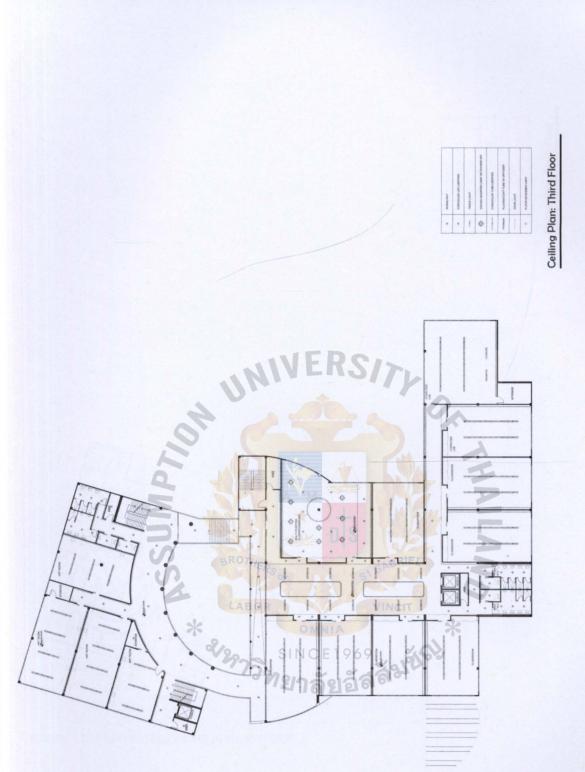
REFLECTED CEILING PLAN: 3rd FLOOR
